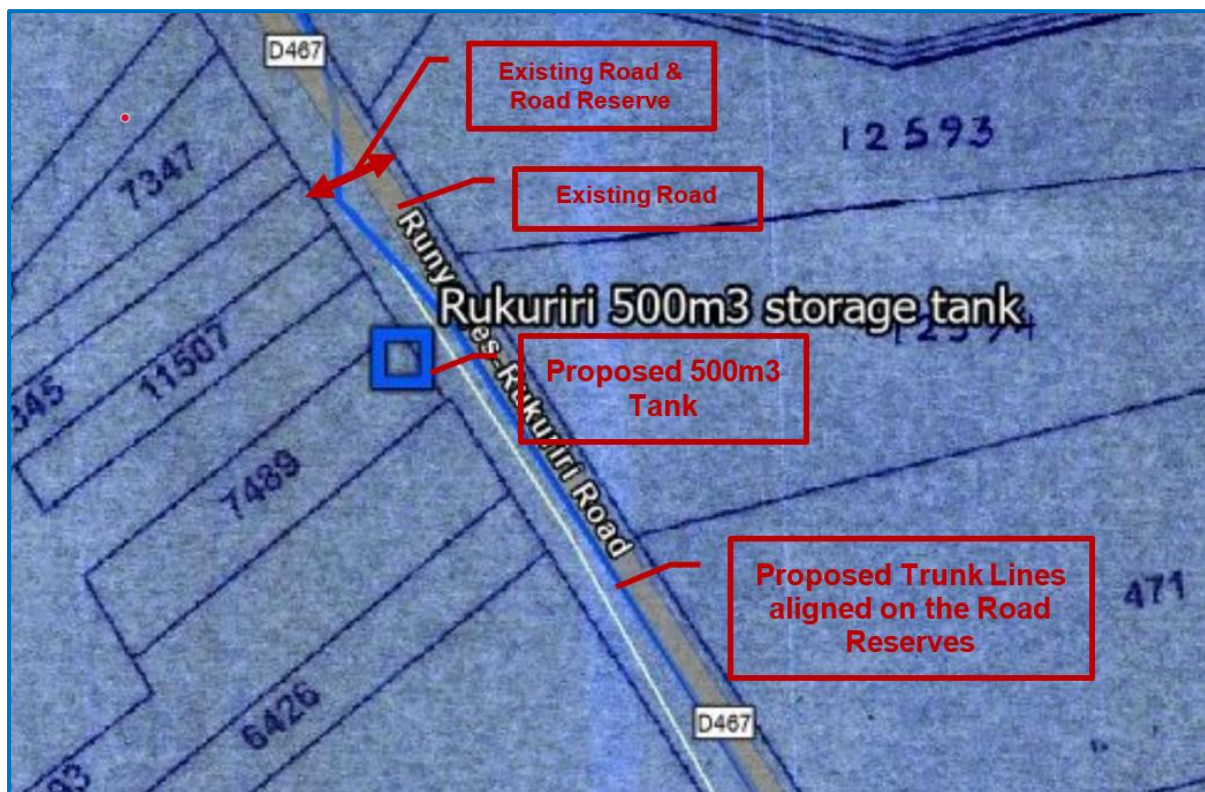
Typical design layout of the proposed pipelines (Runyenjes-Rukuriri Road), BPTs and Storage tanks. Only BPTs and Storage Tanks were determined to be affecting the private properties (mainly land)
